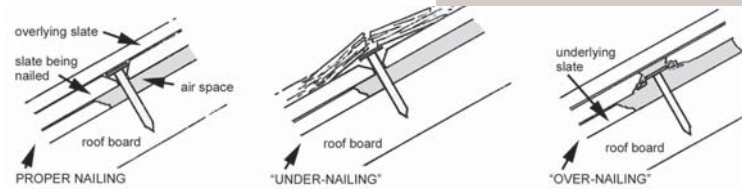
(above): A good slater has no problem nailing slates correctly. When properly nailed, the nail head just sits down inside the slate. When undernailed, the protruding nail head can damage the overlying slate over time. When overnailed, the slate being nailed will crack, break, or cock awkwardly on the roof.
